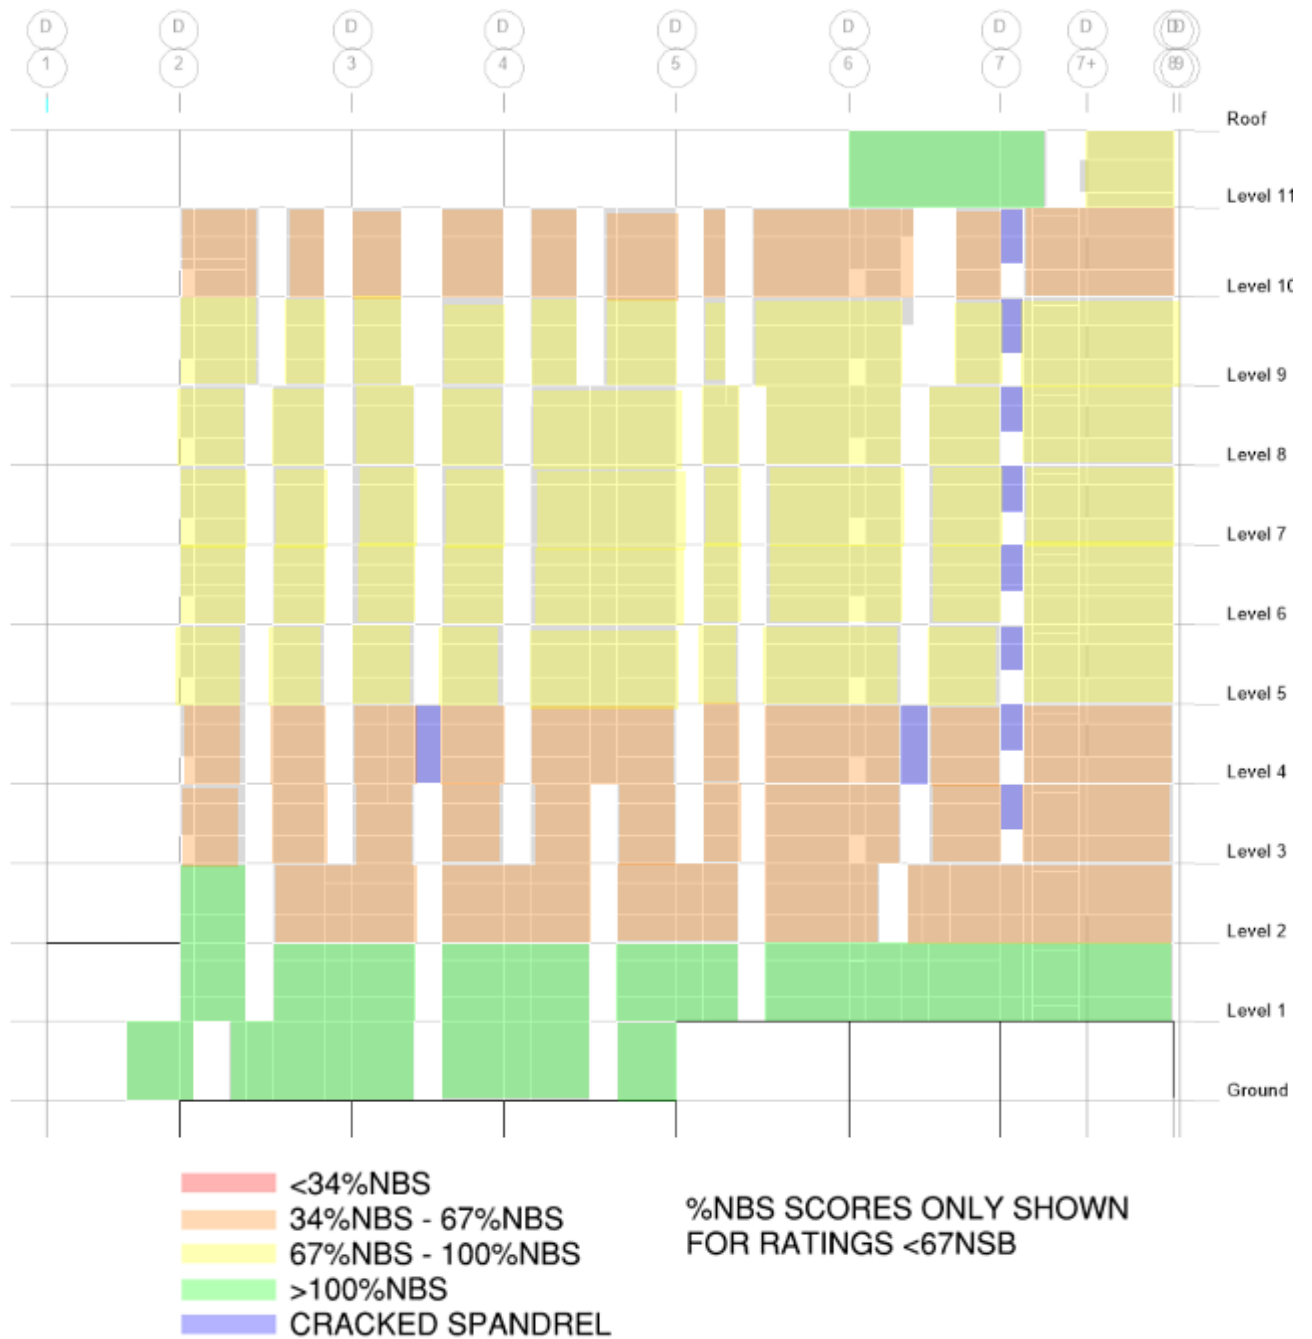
, Critical Longitudinal Direction Wall – North Structure
